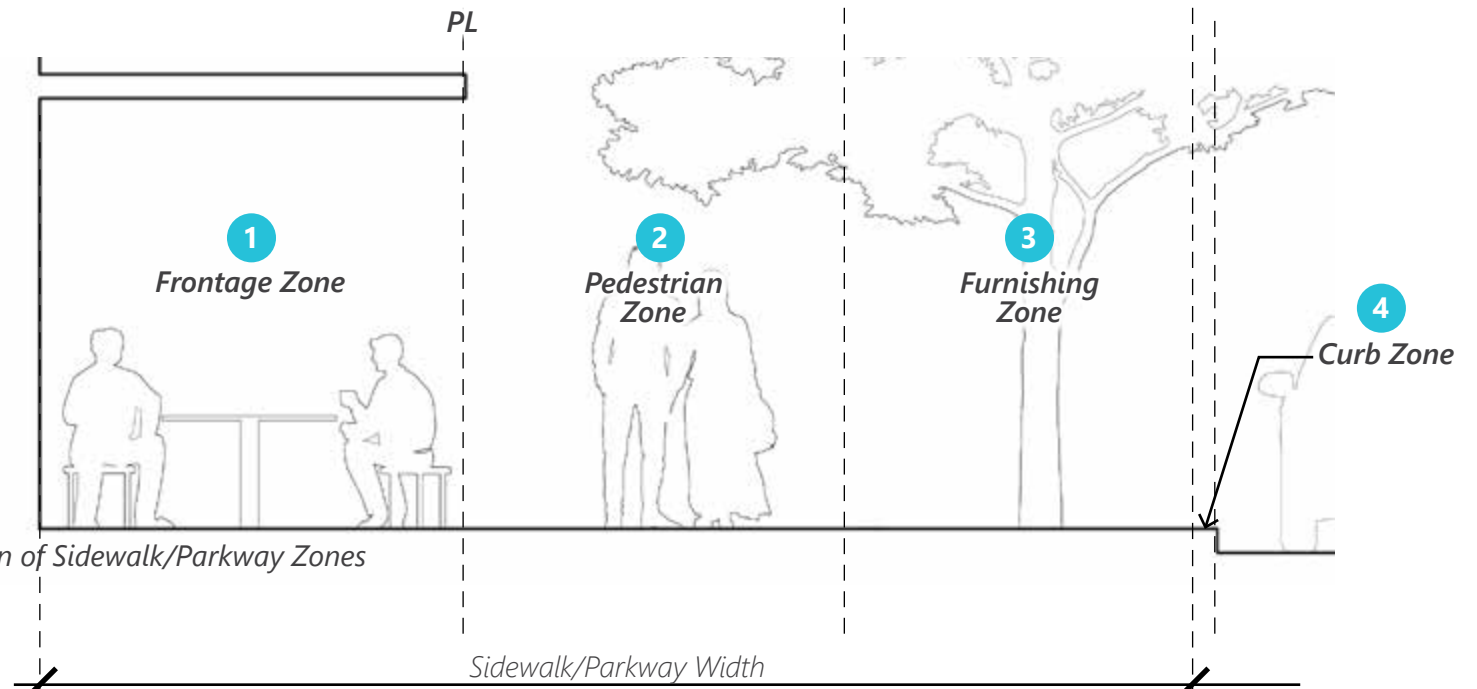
Cross-Section of Sidewalk/Parkway Zones
